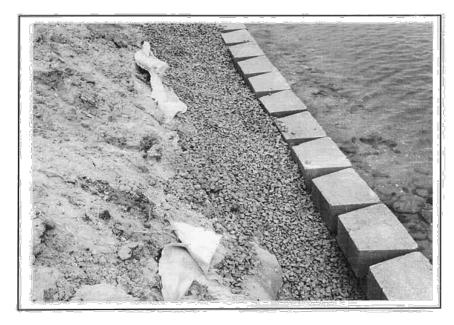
REPLACEMENT WALLING BACKFILLED WITH DRAINAGE MEDIUM IN PLACE - NOTE EXCESS EXCAVATED CUT MATERIAL ON BANK
